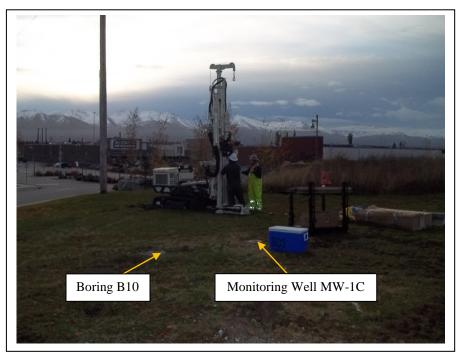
Advancing Boring B11b; looking southeast. (October 9, 2014)
